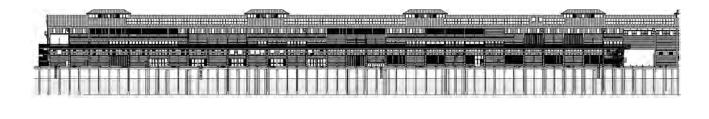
Existing and proposed west elevation to Wharf 4/5 (proposed alterations shown in blue)
